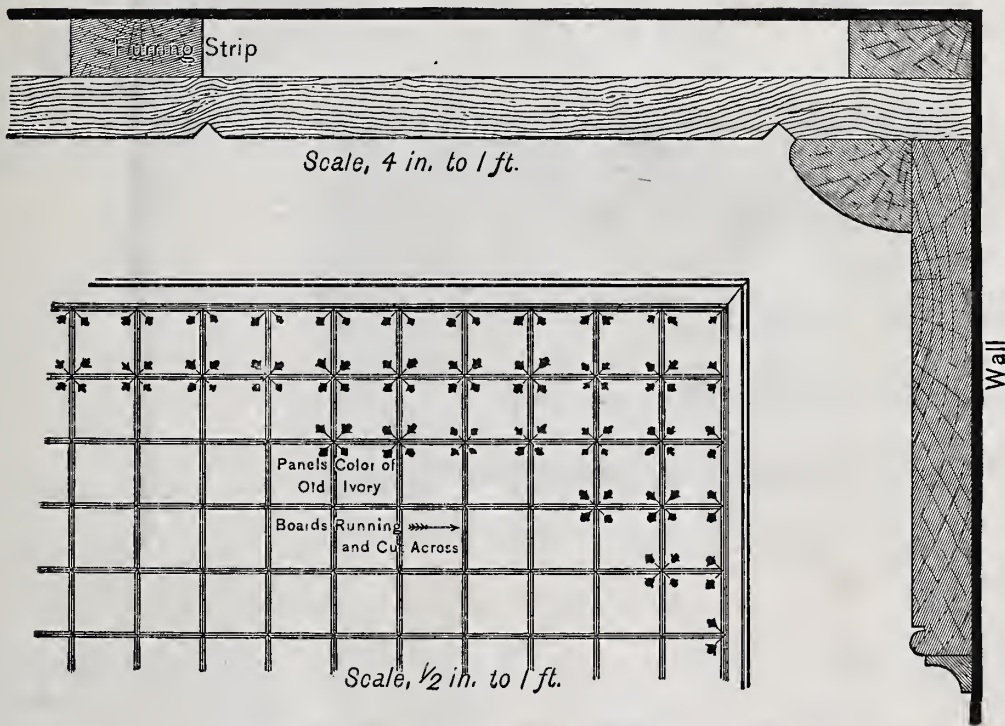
SECTION AND PLAN OF DRAWING ROOM CEILING.
